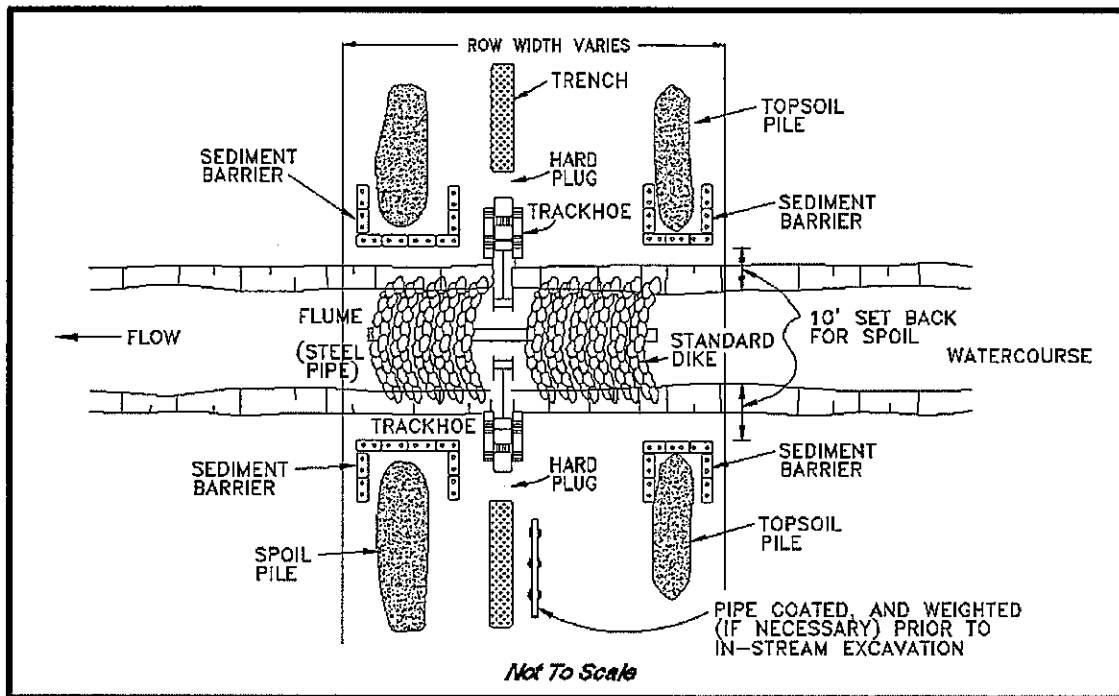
Typical Single Dike with Diversion Pipe Drainage Crossing Method.
